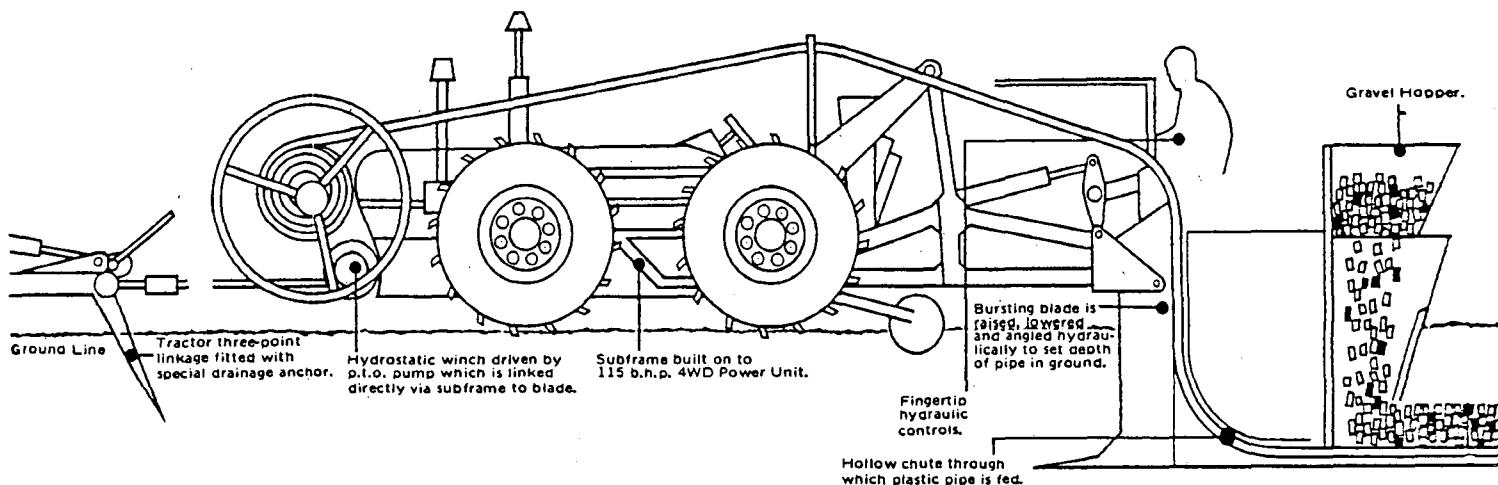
The Bruff TG3 Trenchless Drainlayer
